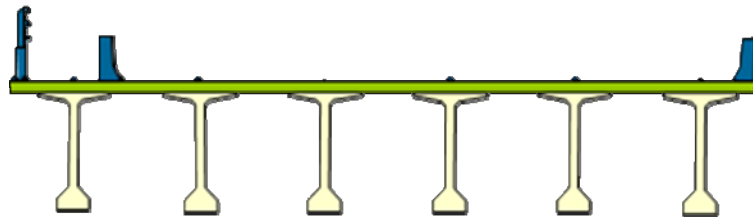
ILLUSTRATION OF A TYPICAL PRECAST-PRESTRESSED GIRDER WITH CONCRETE TOPPOING
